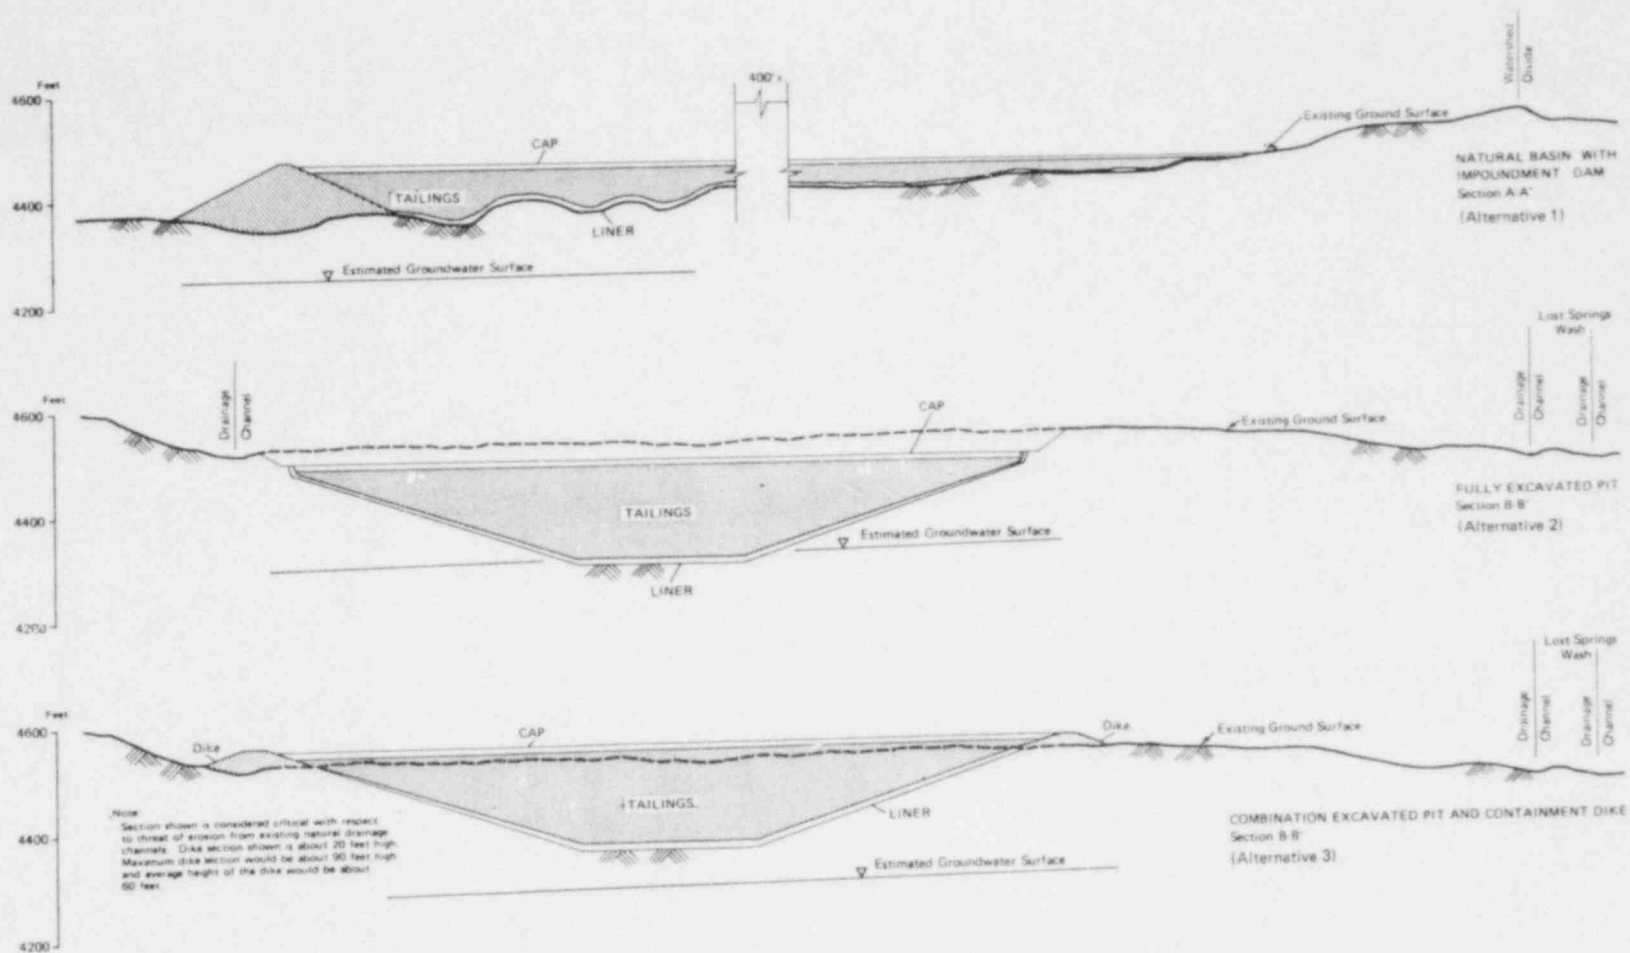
Representative sections through alternative tailings disposal facilities. See also Fig. 10.3. Source: Adapted from Plateau Resources, Ltd., *Evaluation of Tailings Disposal Alternatives, Shooting Canyon Uranium Project, Utah*, prepared by Woodward-Clyde Consultants, San Francisco, Calif., Rev. December 1978, Fig. 3.1.
